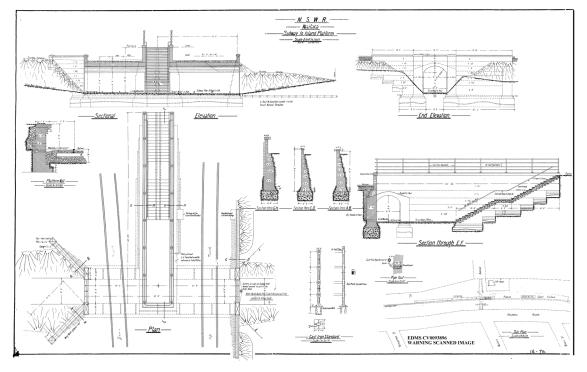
Plan of the subway design associated with Waitara Station, dated 1908. (Source: Sydney Trains Virtual Plan Room)
